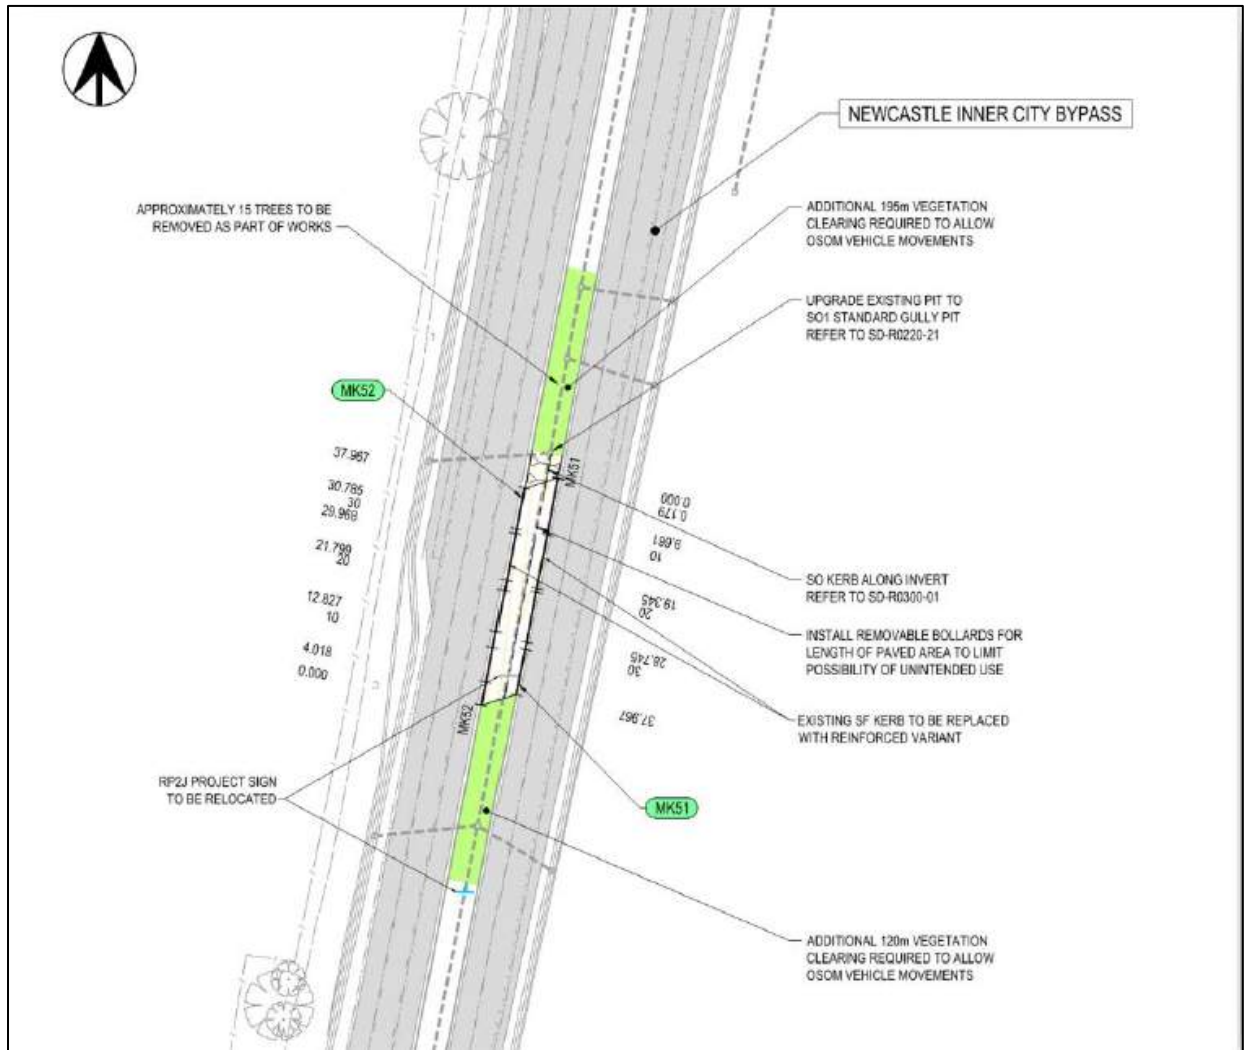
Site 5 proposed works at median crossover on Newcastle Inner City Bypass, near Janet Street overpass
